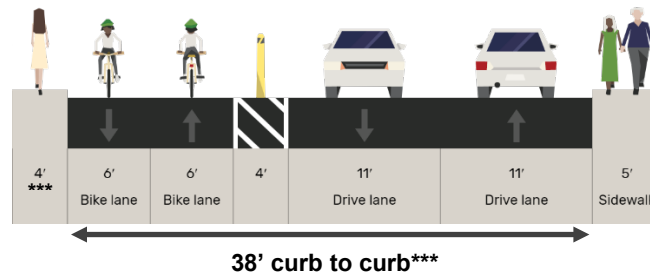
Section C (Butler Street - 62nd Street to One Wild Place) – Proposed Option 2
